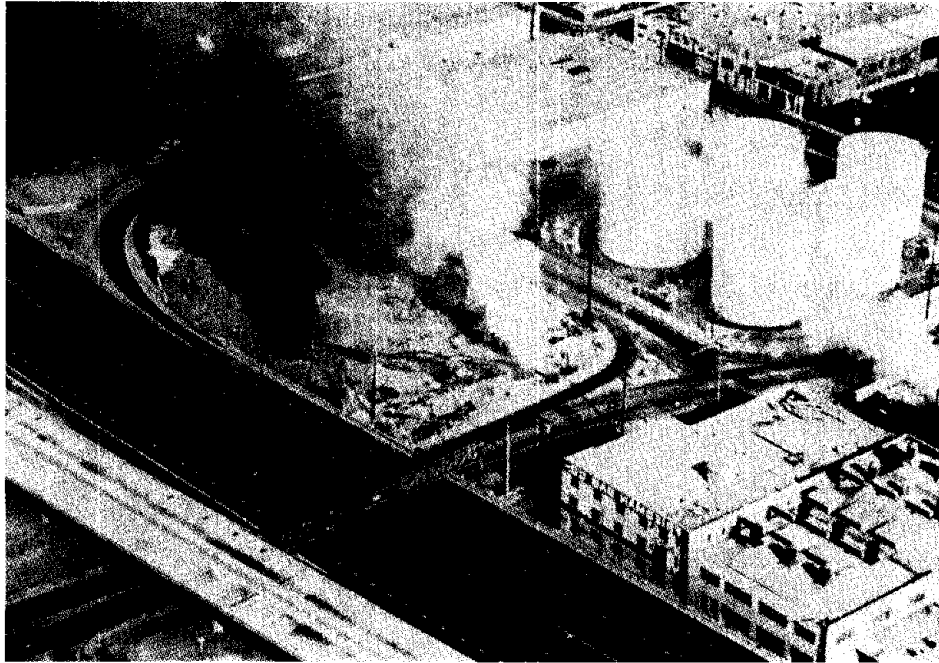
Collapsed tunnel due to Los Angeles subway fire.
